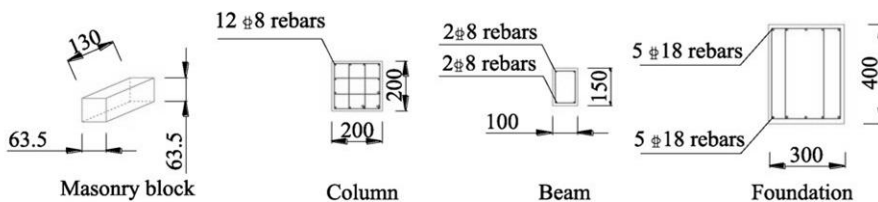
Structural cross-sections and bricks dimensions [49].
